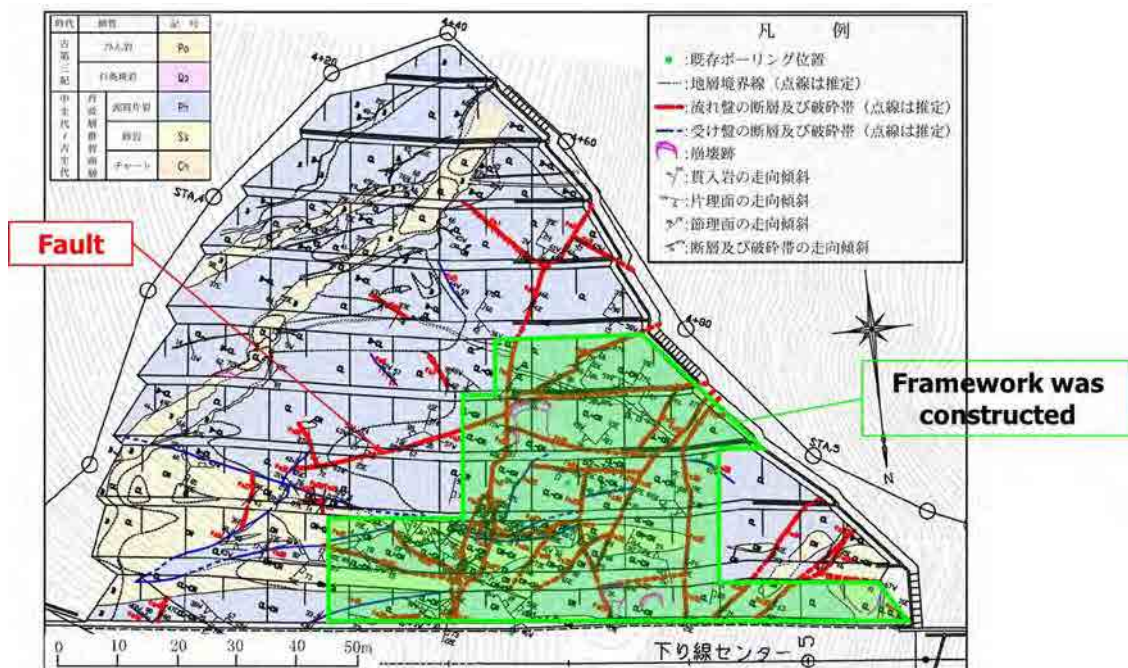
Geotechnical Observations of a Large Cut Slope
